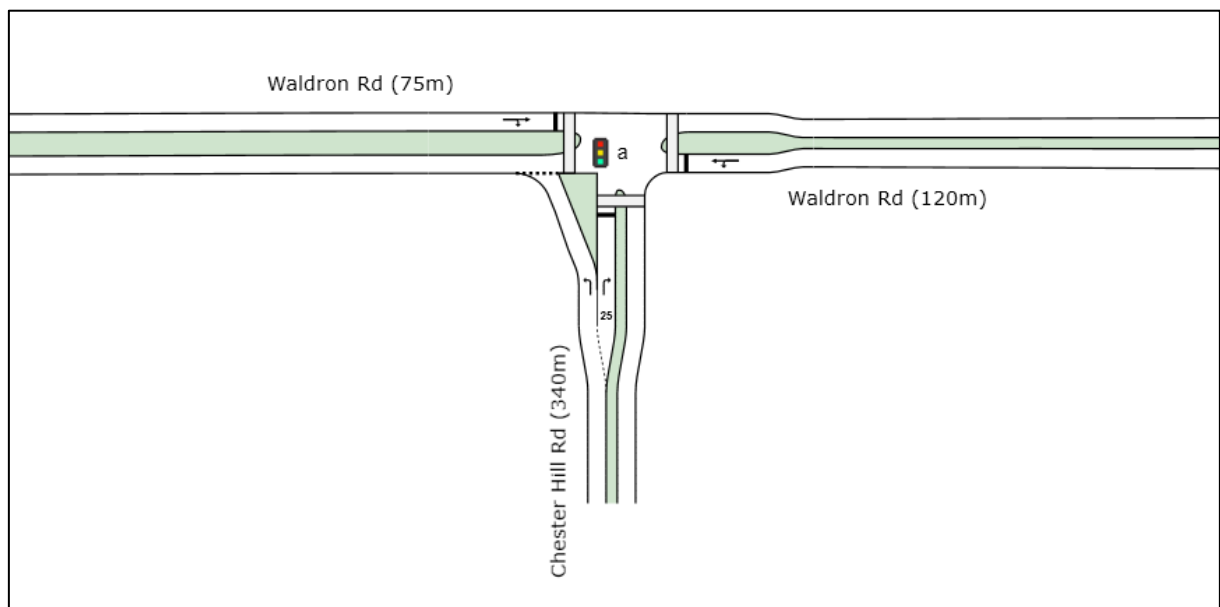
Chester Hill Road / Waldron Road Intersection Upgrade
